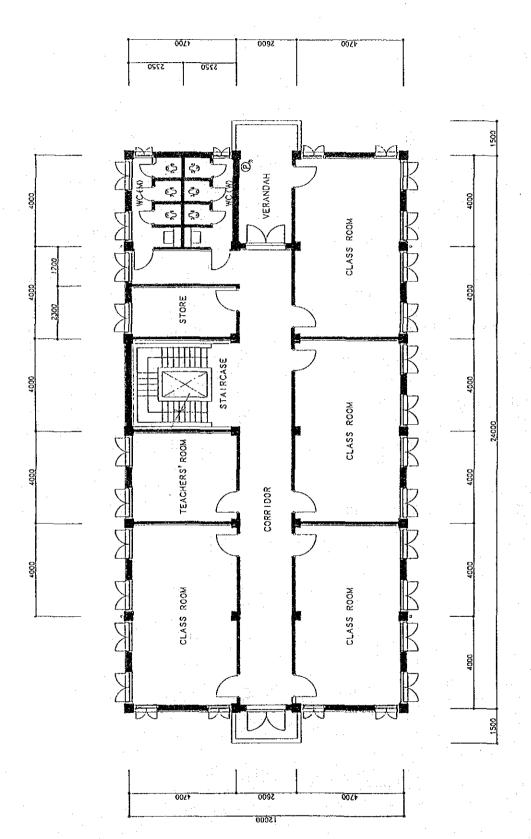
(2) FIRST FLOOR PLAN (4-CLASSROOM TYPE)
